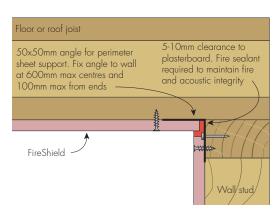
Fire Rated Ceiling to Wall – Alternate Detail Direct fixed to joist
